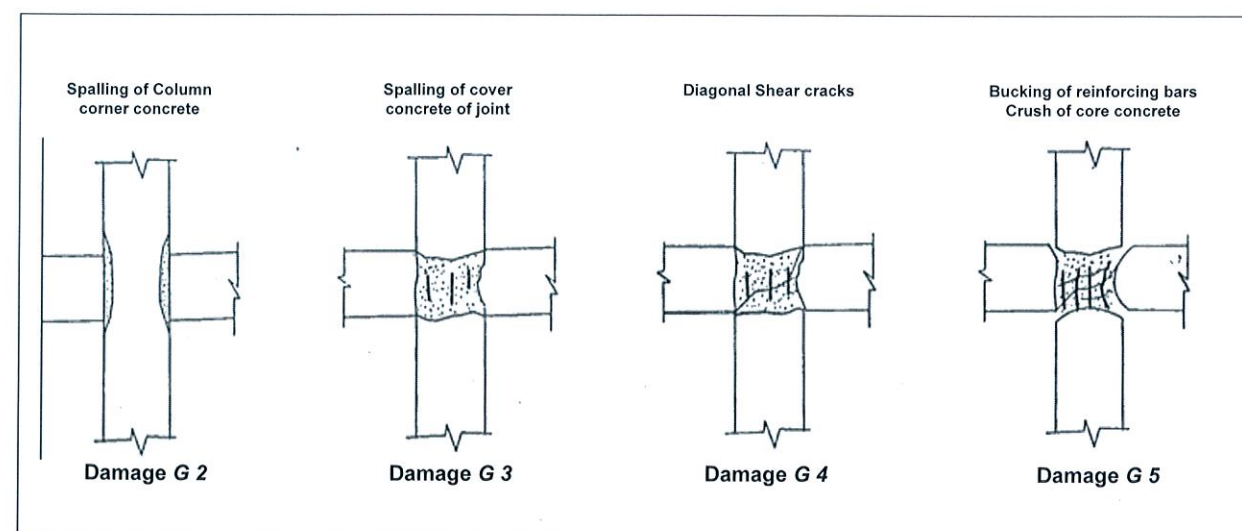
Grades of Damage in RC Beam-Column Joints
